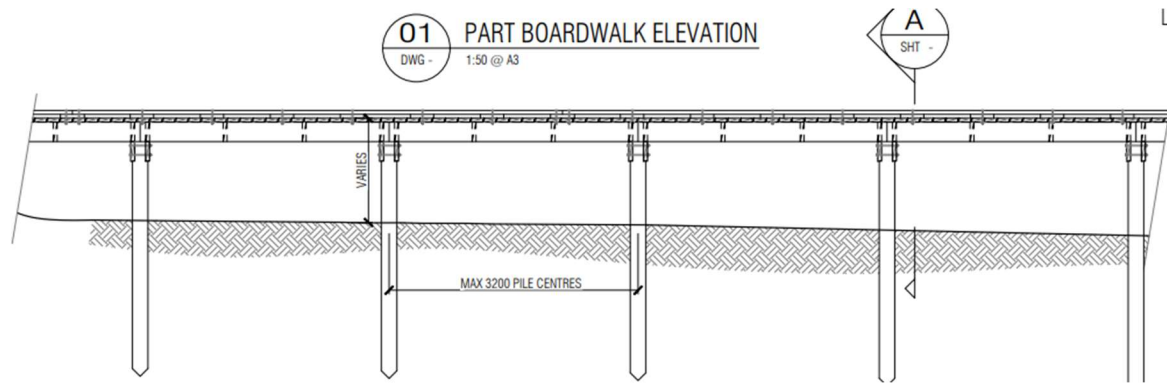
Boardwalk elevation from Frame Group drawing sheet 24/009 – 04
